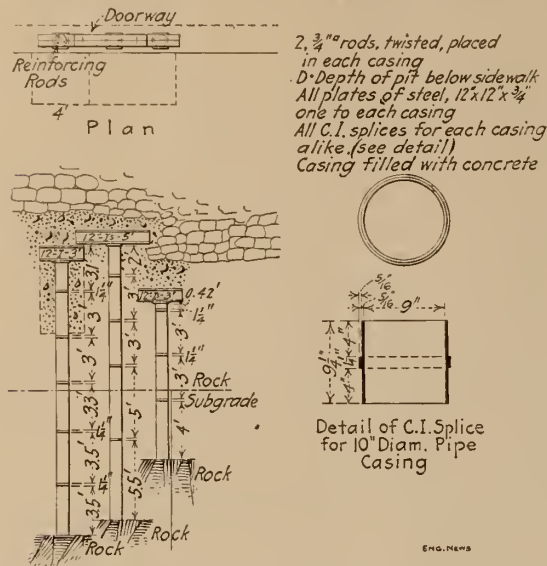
UNDERPINNING BUILDINGS WITH STEEL-PIPE PILES FILLED WITH CONCRETE
